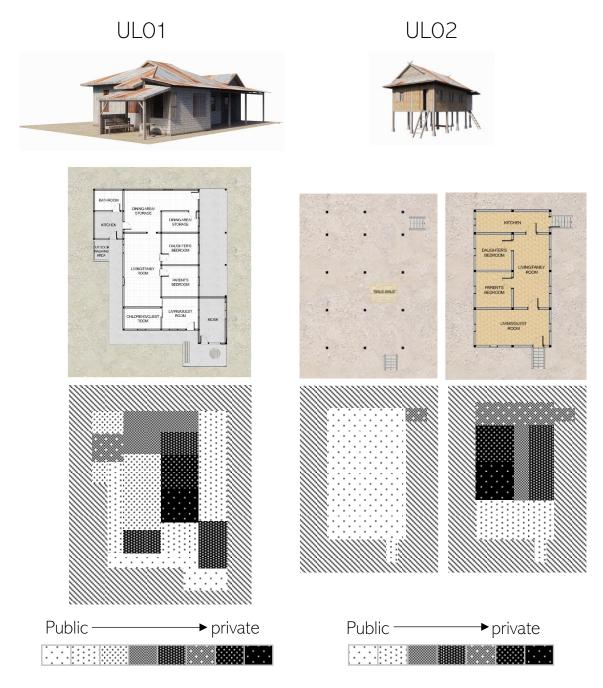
UL's houses in Sernaru with 3D render, floor plan and layout analysis
